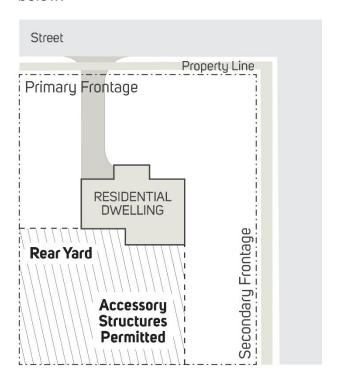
Figure XXXX: Graphic illustration of approved location for accessory structures on a corner lot.
